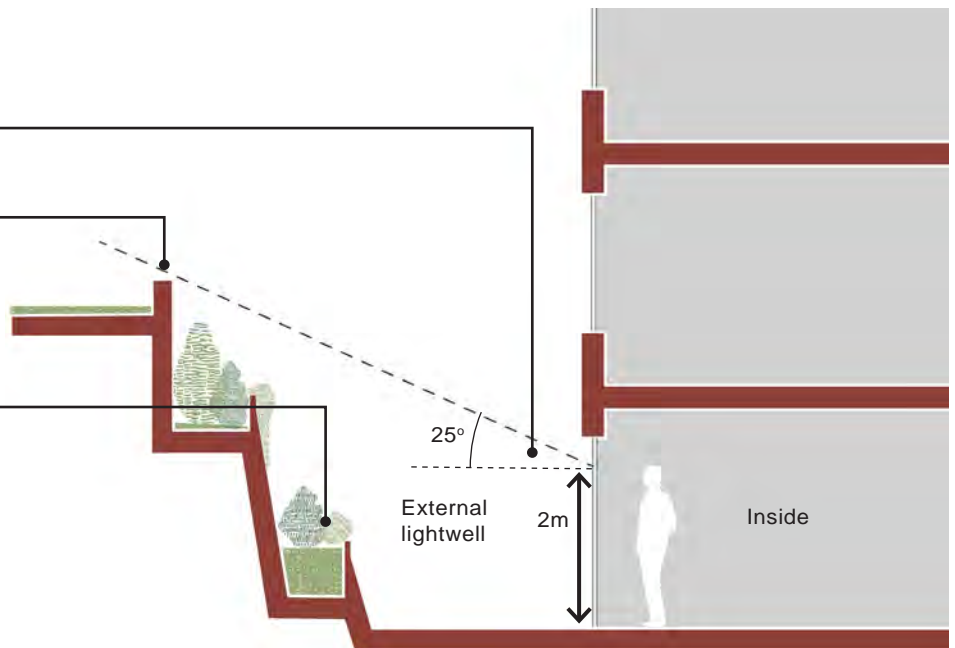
Section showing the design guidance for creating a light well for a basement or lower-ground floor.
